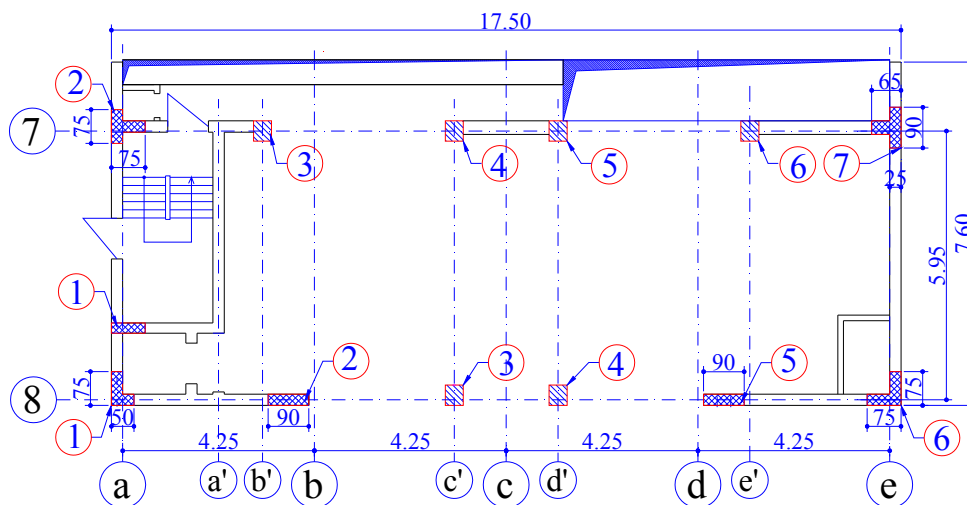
Plan of first floor of the building (the digits in circle represent the explosion steps).
